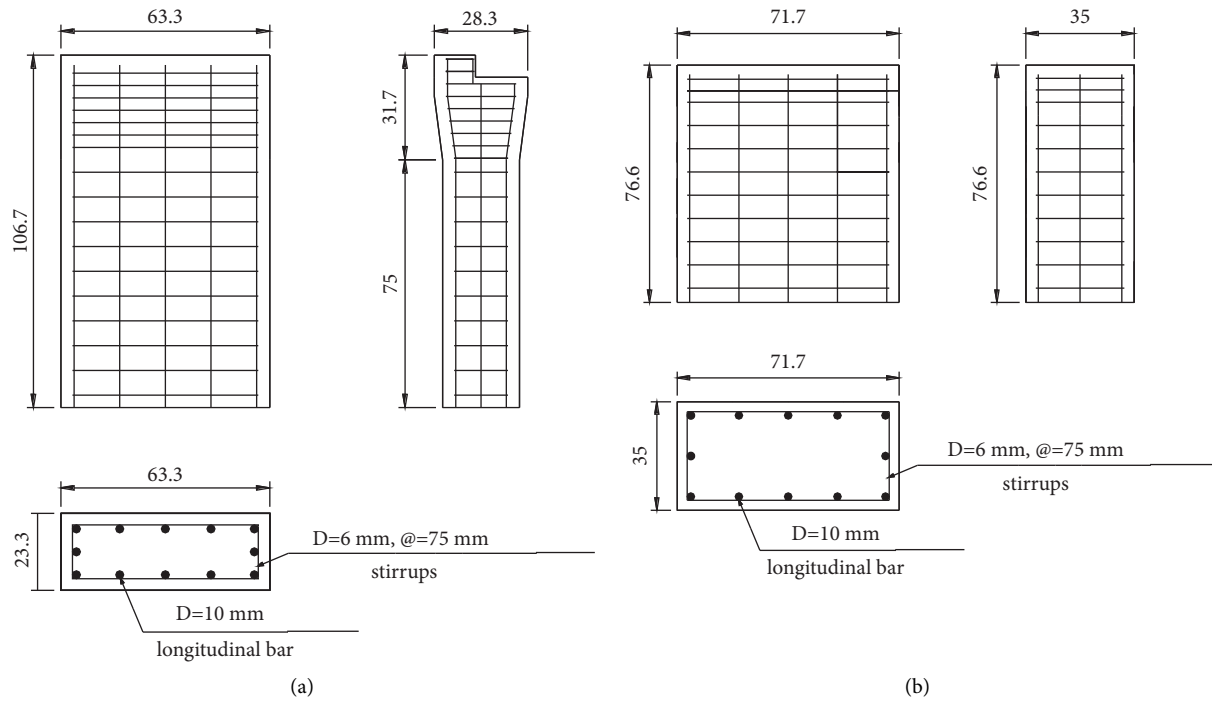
Specimen of pier drawings for (a) side piers (Pier-1 and Pier-4) and (b) main piers (Pier-2 and Pier-3) (unit: cm).
